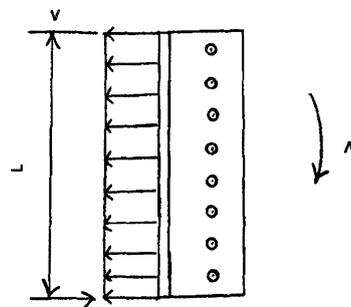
Induced force in shop welds or bolts (equal to shear at vertical yield lines).
